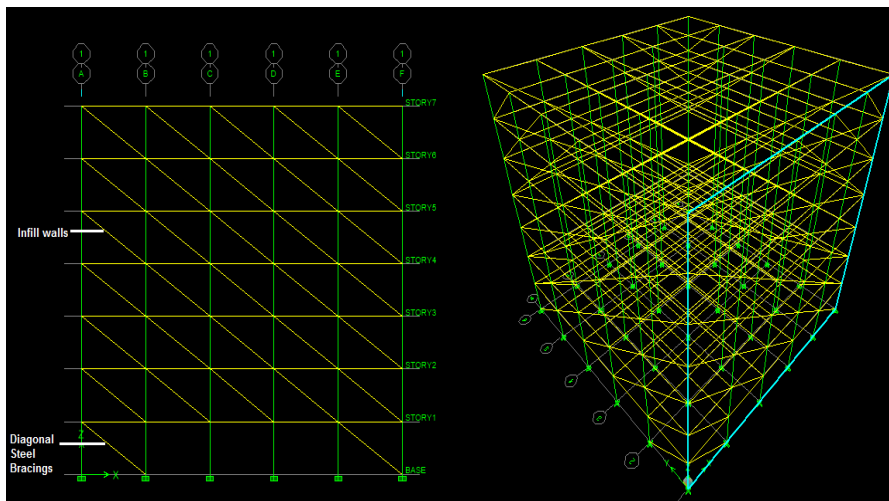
(d) Models of Low rise building with Diagonal steel bracings
